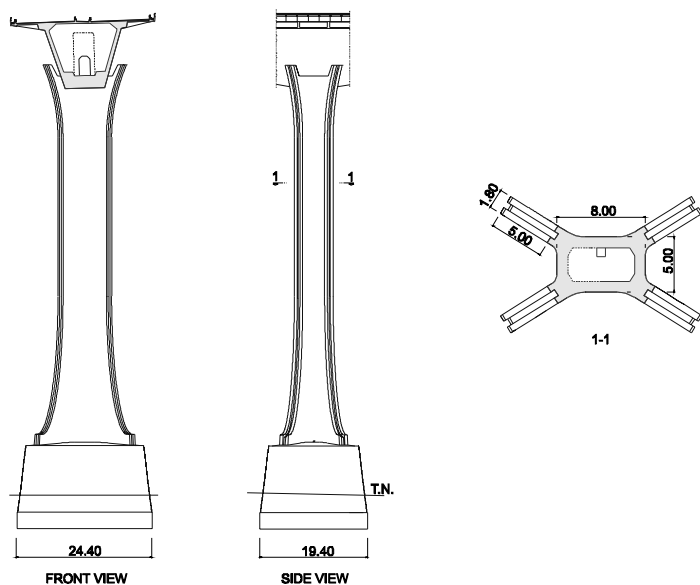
Main piers - front and side views, cross-section Fig. 21 View of main piers
